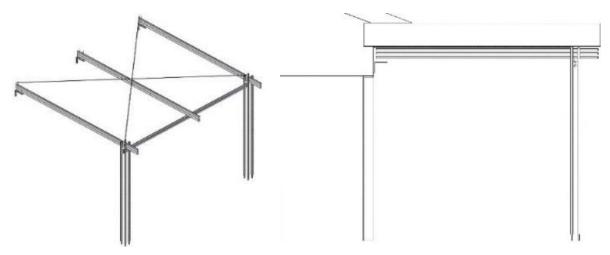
Isometric view of one module and a section of the veranda. 2016.
